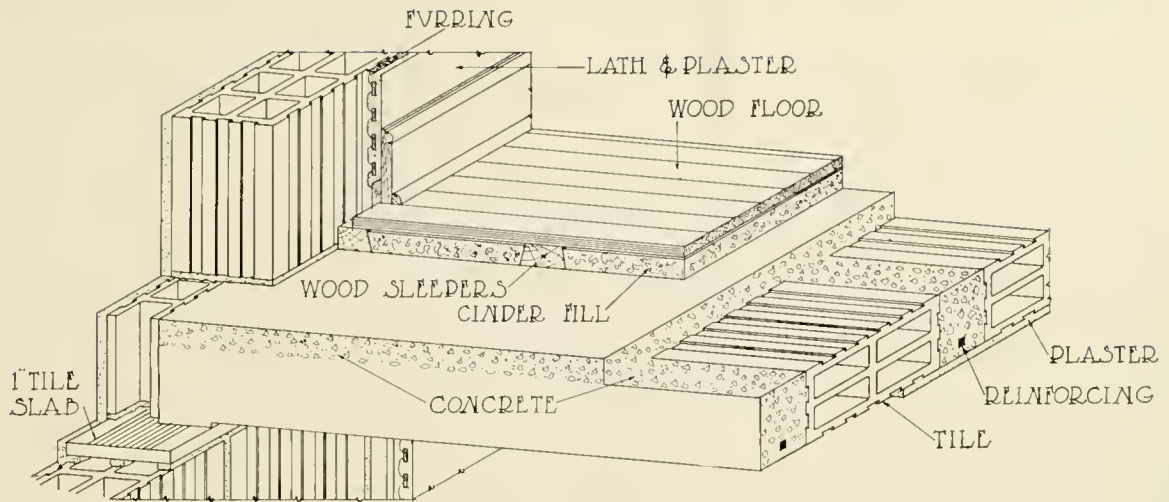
Simple detail of one way reinforced tile and concrete floor. Thickness of floor and size of reinforcing rods depend on the width of span.
